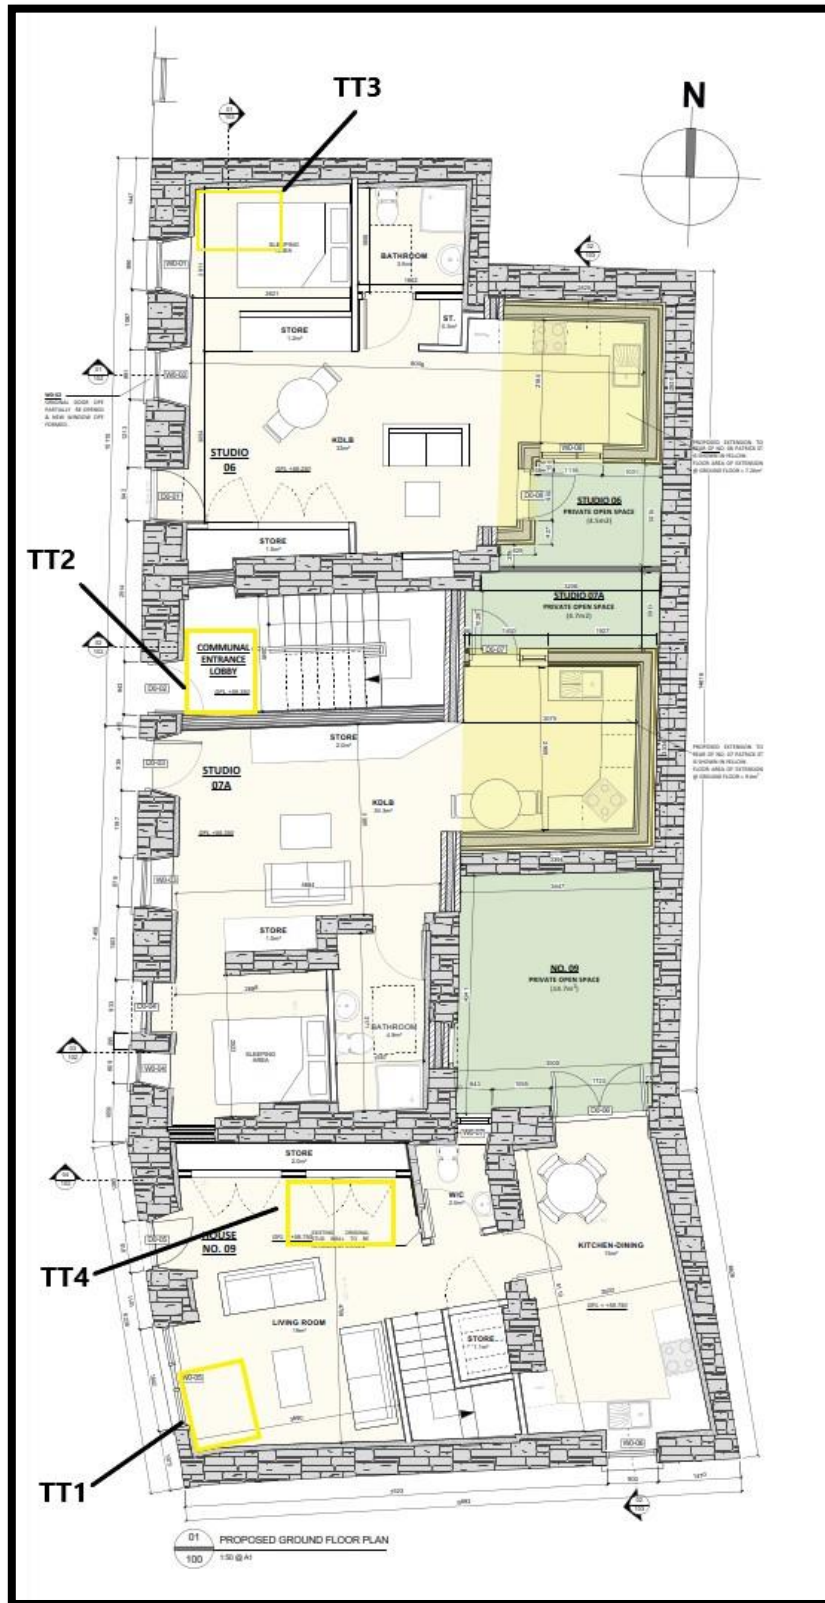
Showing proposed development at No 06-09 Patrick Street Upper and location of test trenches 1-4.
